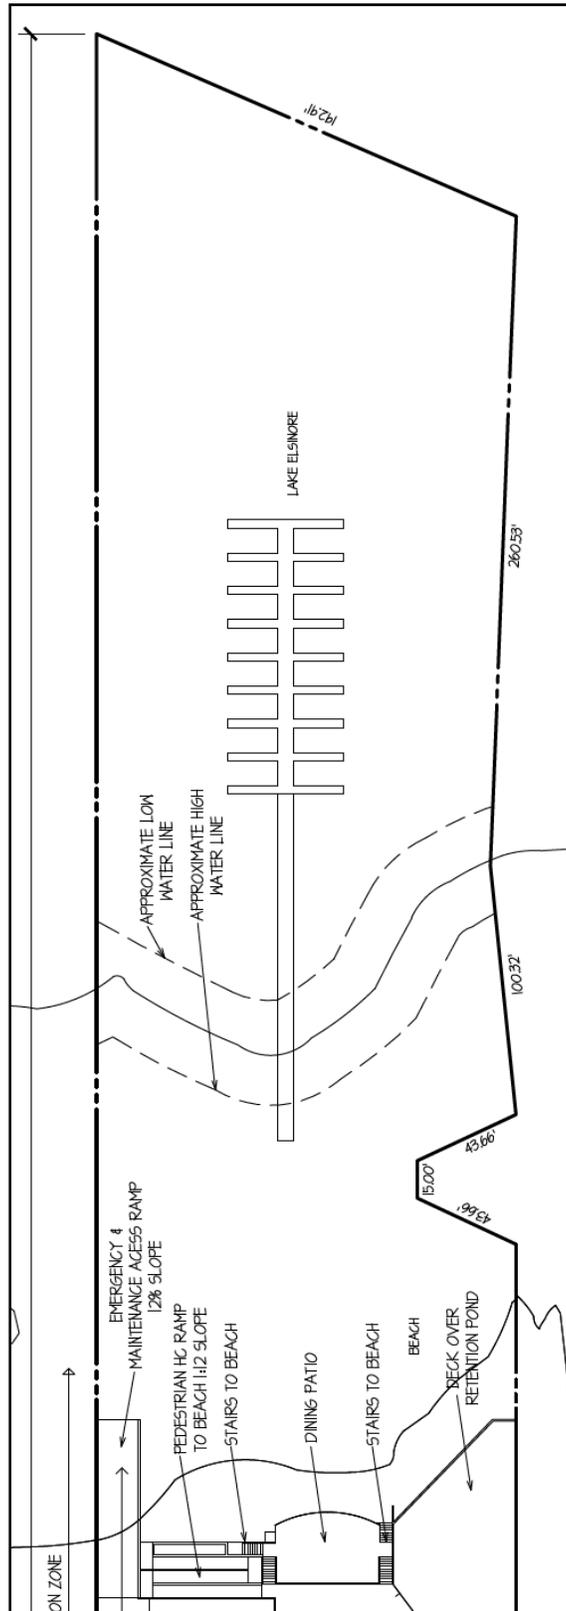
B – Site Plan, Grand Avenue Fronting Portion
